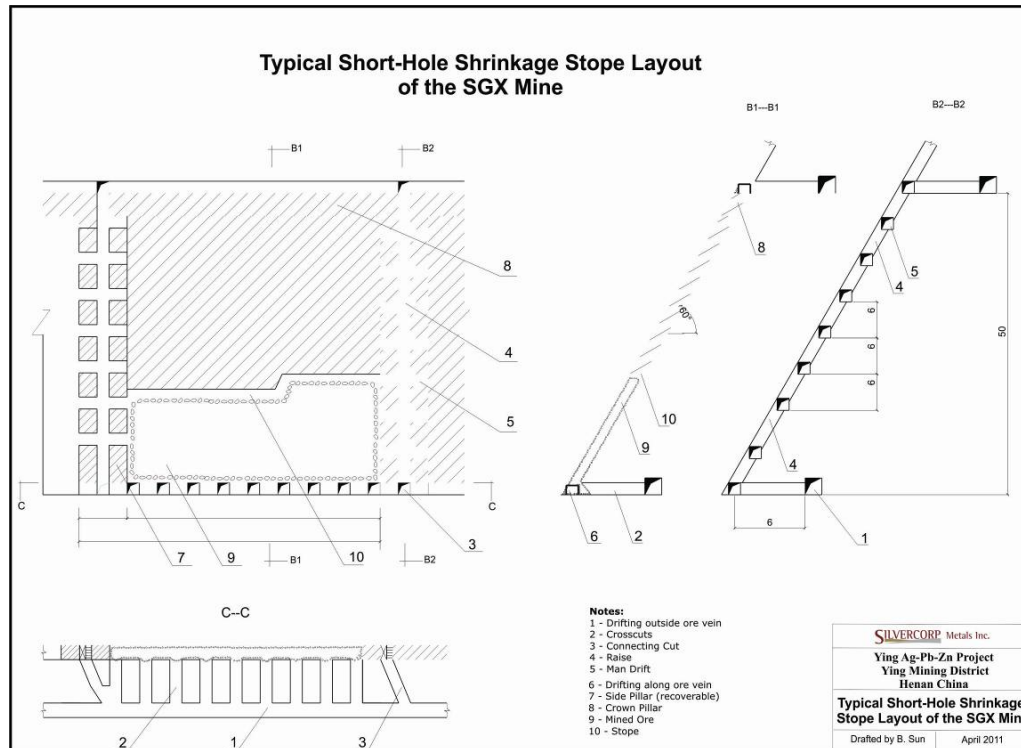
Typical short-hole shrinkage Stope Layout of the SGX Mine
